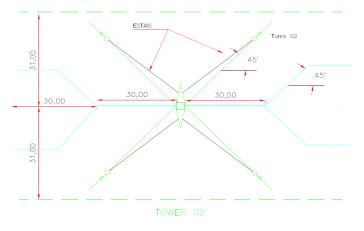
Towers localization from the LT Oriximiná sample – Silves CD. The plan of tower 565 (Pic. 3) has the compact characteristic to supply places with reduced space.
